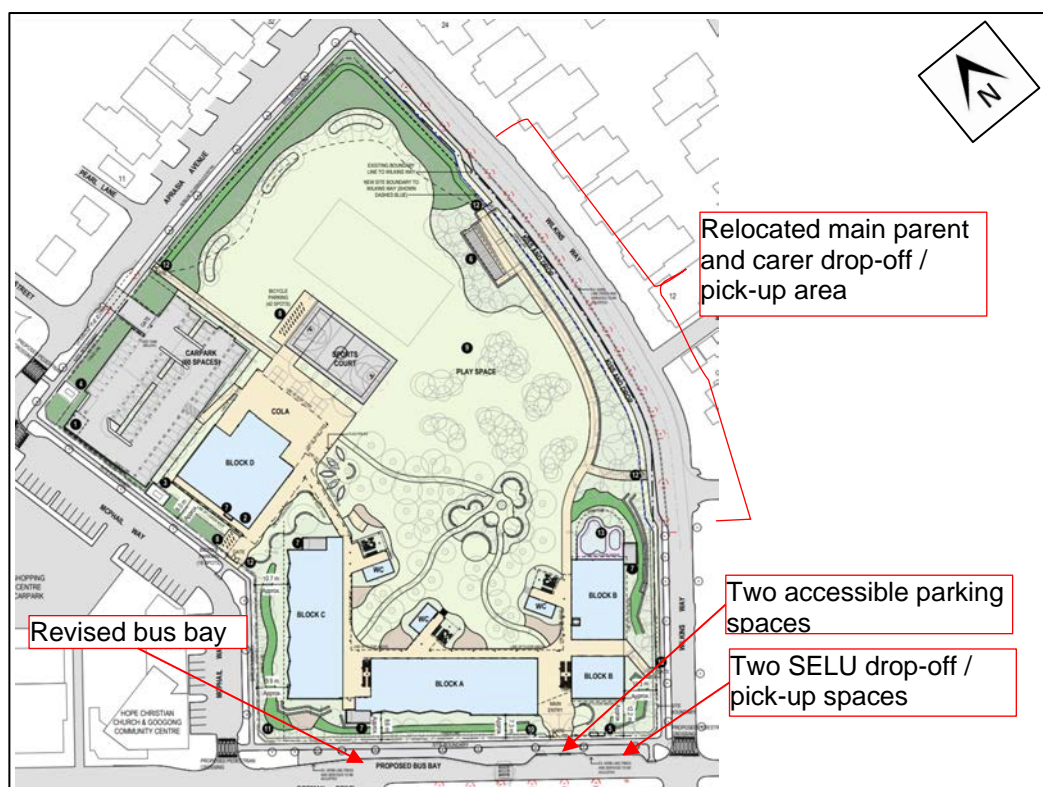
| Revised layout (Source: Applicant's RtS 2021)
